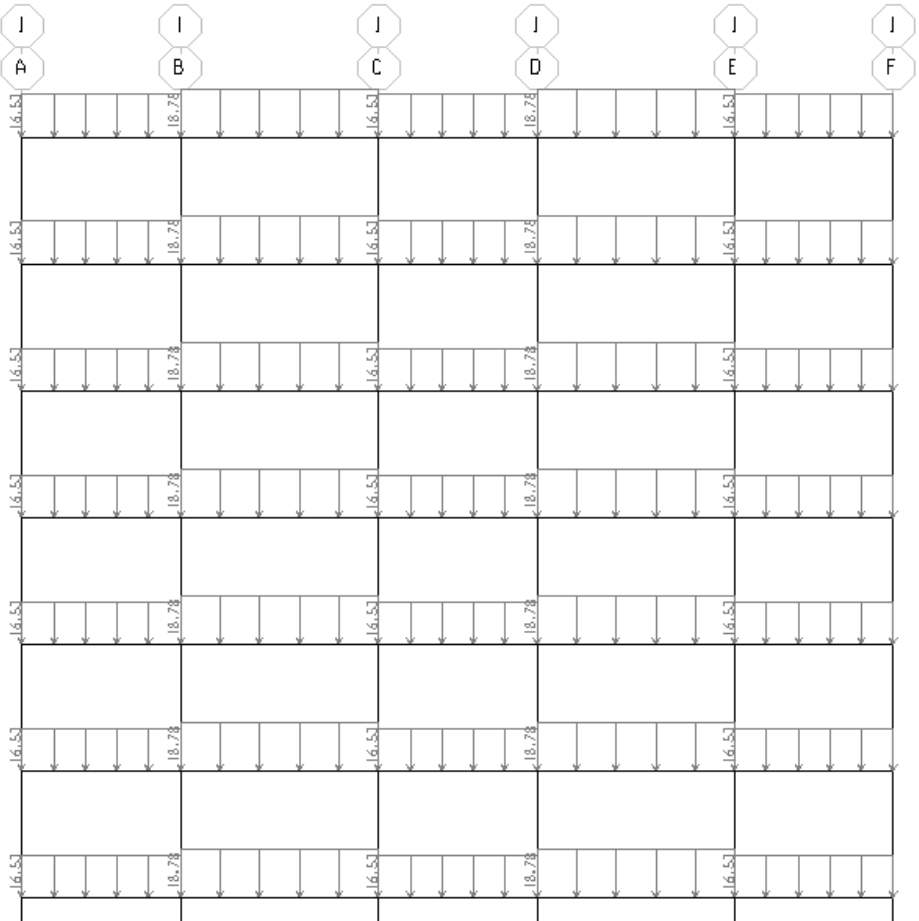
Dead loads transmitted from slabs and walls, distributed to the beams
